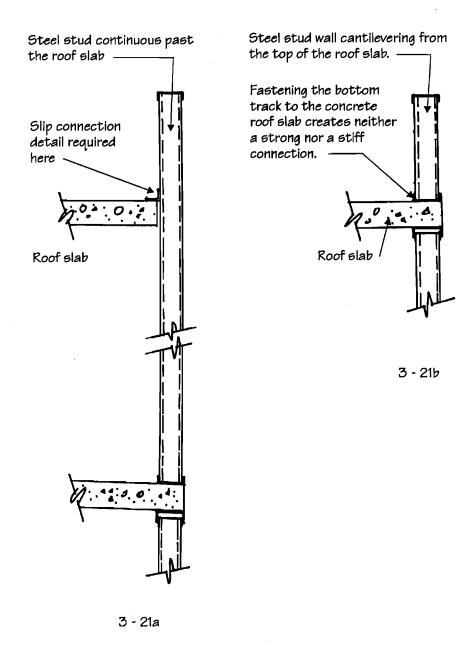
21 STEEL STUD PARAPET DETAILS
